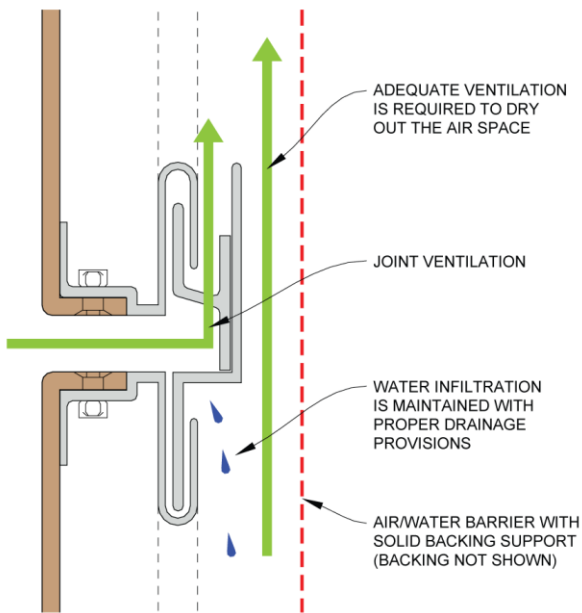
Drained and Back Ventilated Rainscreen System Horizontal Joint (Example)
